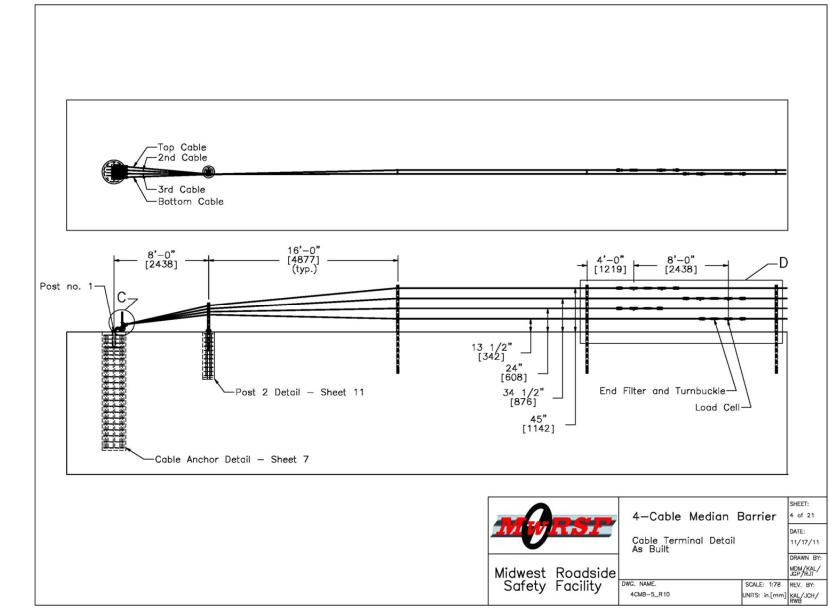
Cable Terminal Layout, Test No. 4CMB-5
